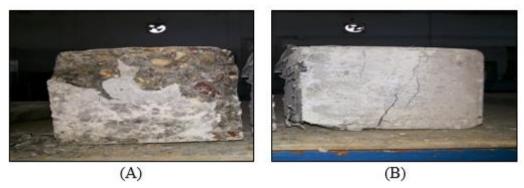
Crack Pattern of Concrete Specimen under Compression Test in Sulfate Water Curing; (A) NSC and (B) HFRPC
